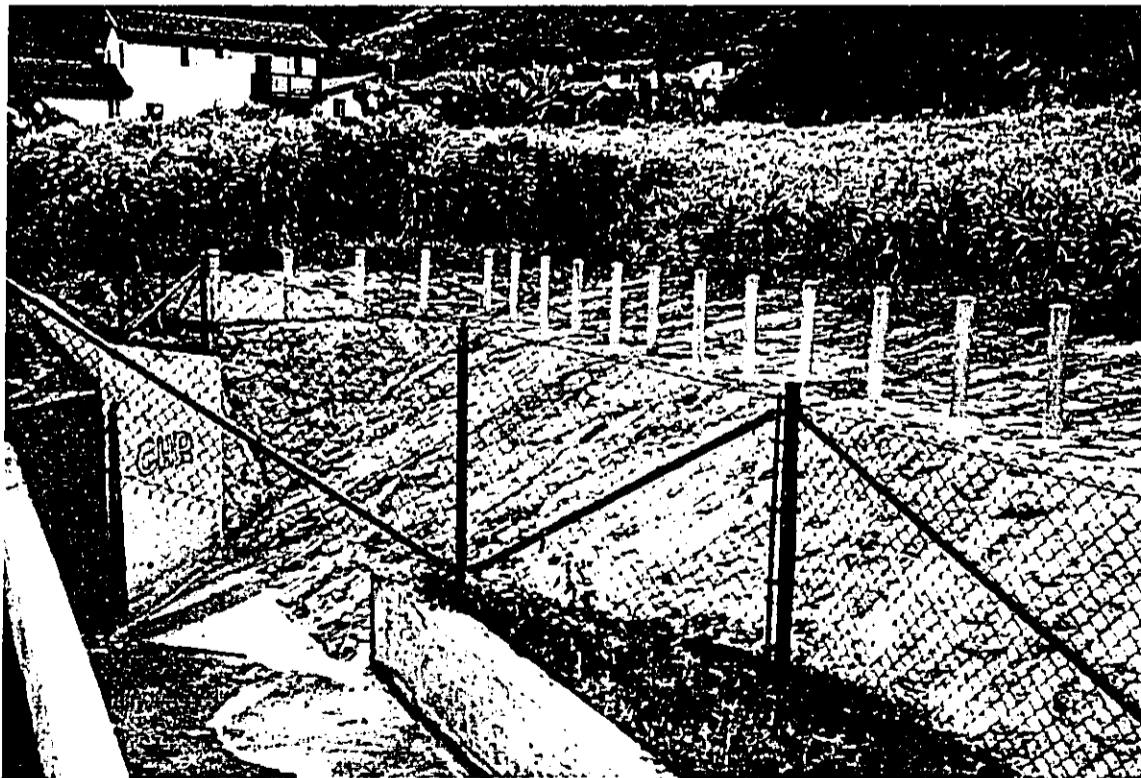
Box culvert up-gradient of Pookela Street - project area is located in background
